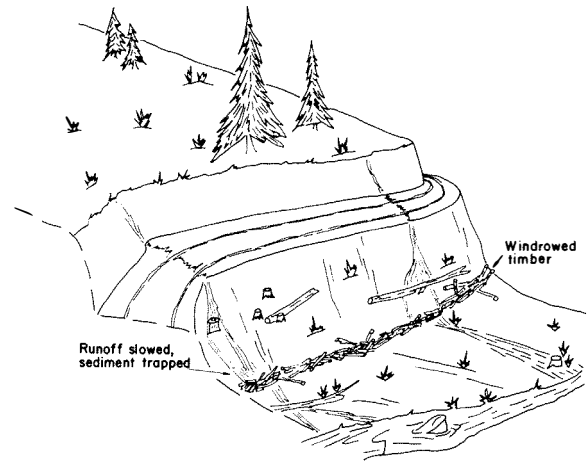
Slope obstructions to slow runoff and trap sediment.
